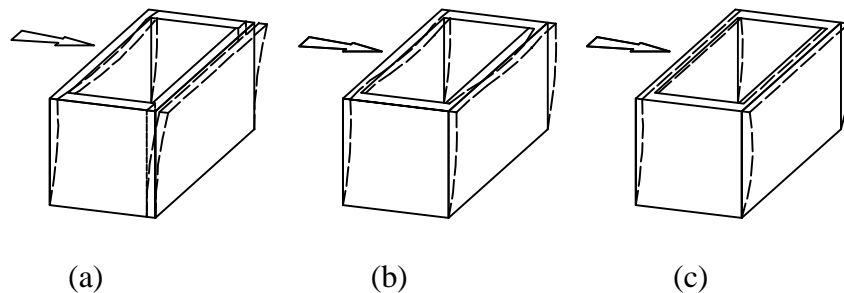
Seismic behavior of a masonry building - influence of ties and diaphragms; (a) building with wooden floors and without ties; (b) building with wooden floors and tied walls; (c) building with rigid floors and tie-beams (Tomaževic, 1999)
